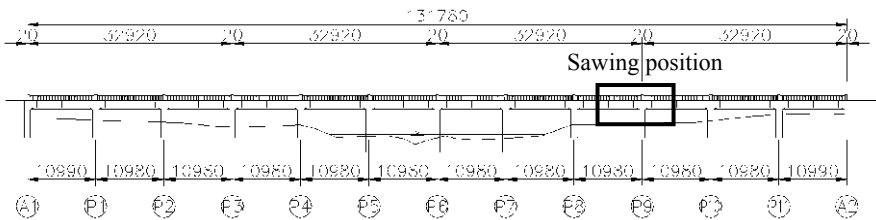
Elevation view of Nougawa bridge (view from ocean side)
